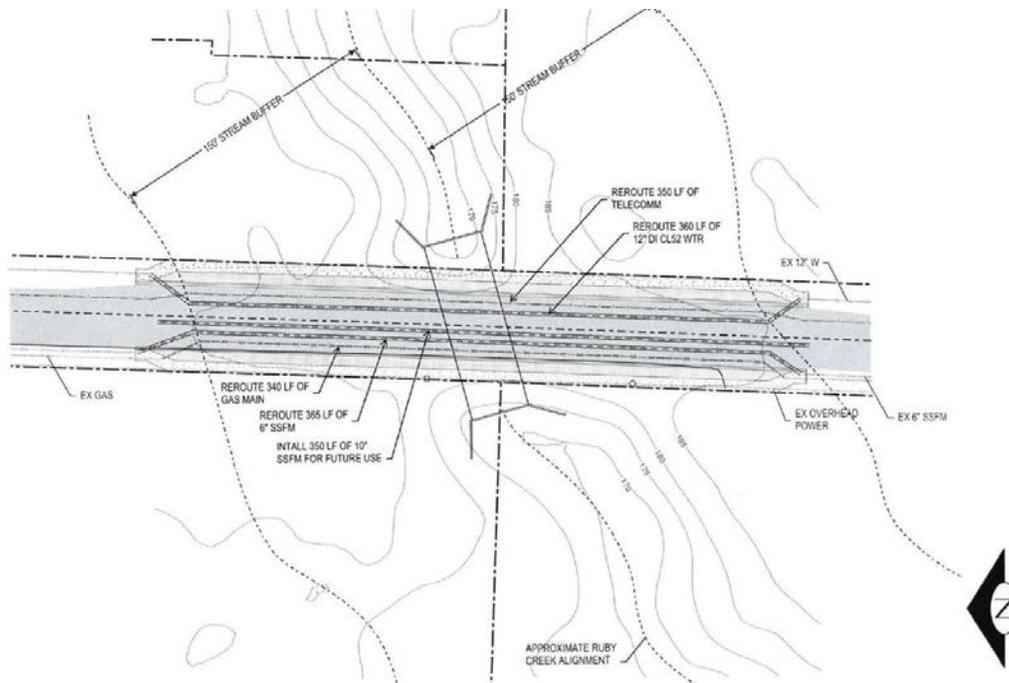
The City has developed preliminary culvert replacement plans for the Ruby Creek culvert under Sidney Road SW and is seeking grant funding for this project.
